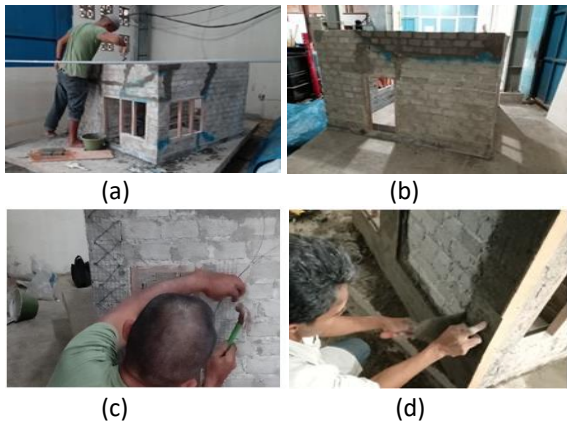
Repair and retrofitting process: a) patching cracked sections; b) installing bricks; c) installing woven wire mesh; d) plastering the retrofitted area
